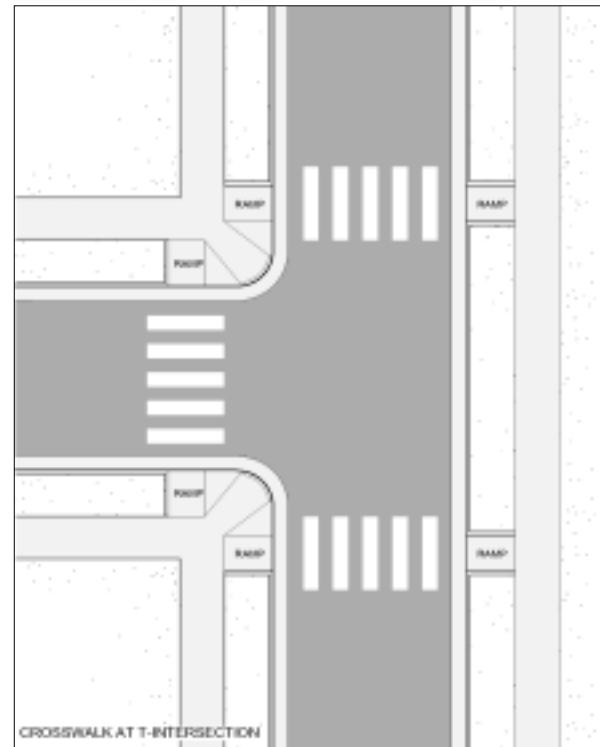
Since legal crosswalks are located at each leg of a T-intersection, so, too, should curb ramps.
